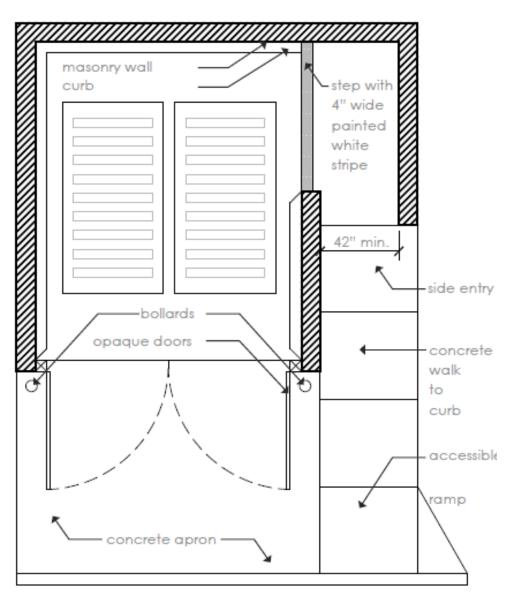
TRANSH ENCLOSURE EXAMPLE PLAN
